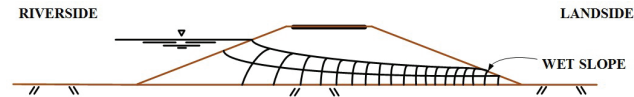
Homogeneous embankment section on impervious foundations with emerging seepage on the landside slope (after USACE 2000).
